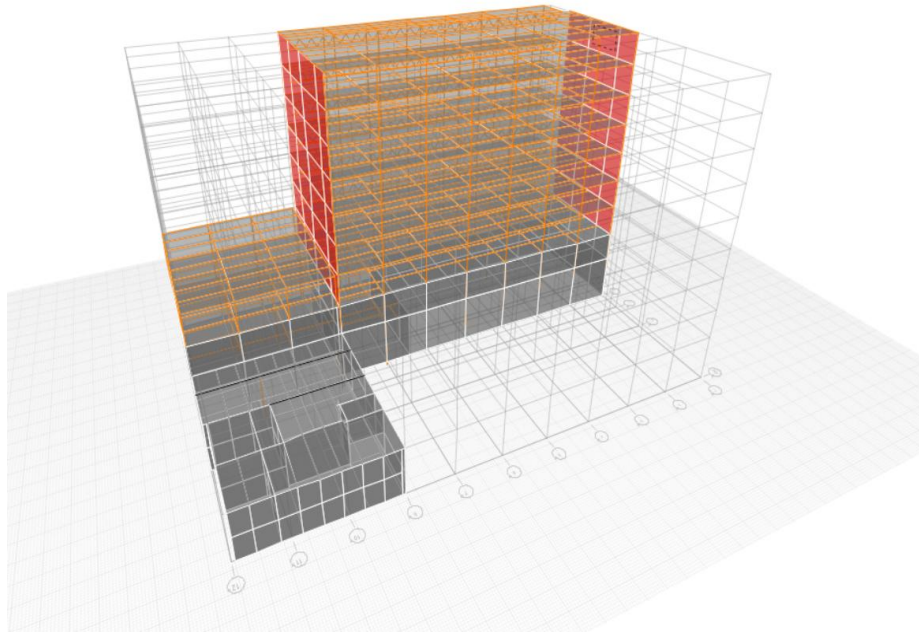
Three-dimensional ETABS model of the JPL 183 building, showing the steel frame (moment-resisting beams and columns) as line elements and the two primary shear-wall piers (in red) on the east and west sides that provide significant vertical and lateral stiffness to the structure
